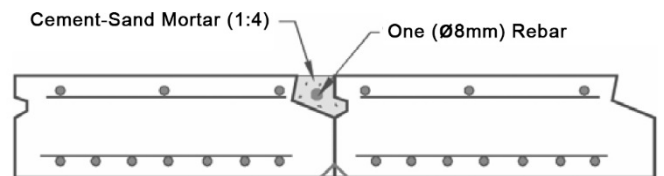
Typical detail of longitudinal joint between ASLAN AAC panels.
